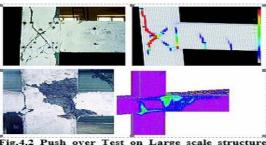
Push over Test on Large scale structure (Reddy. et., al, 2010)
